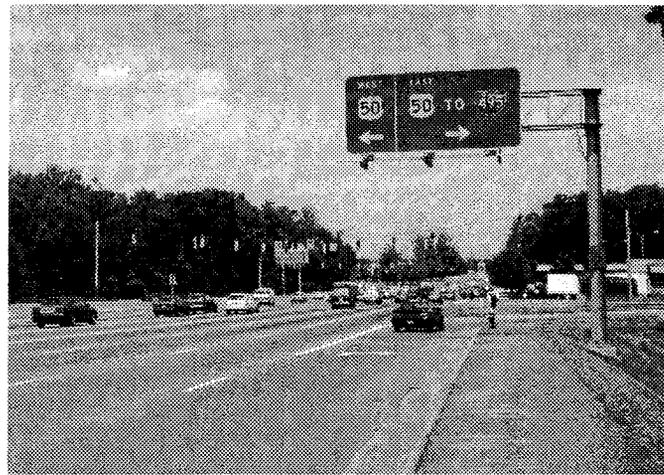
SPUI at Gallows Road and Arlington Boulevard, Northbound Cross Road
